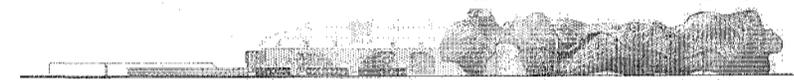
Alley elevation, view of overskirt (building 1,2,3, and 5) and pods that stretch the surface of the metallic skin on building 6
